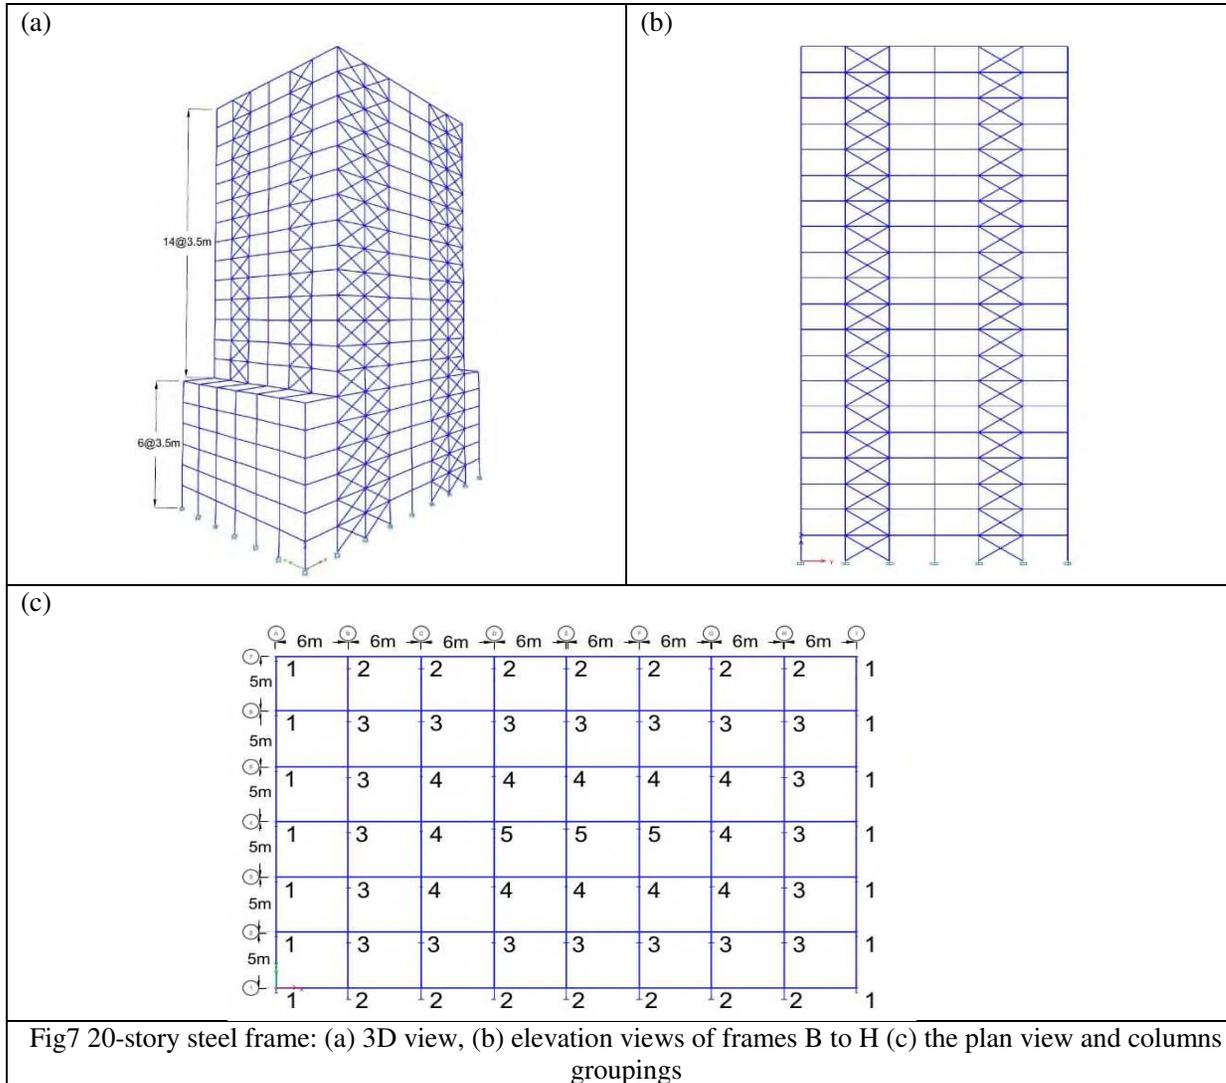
20-story steel frame: (a) 3D view, (b) elevation views of frames B to H (c) the plan view and columns groupings
